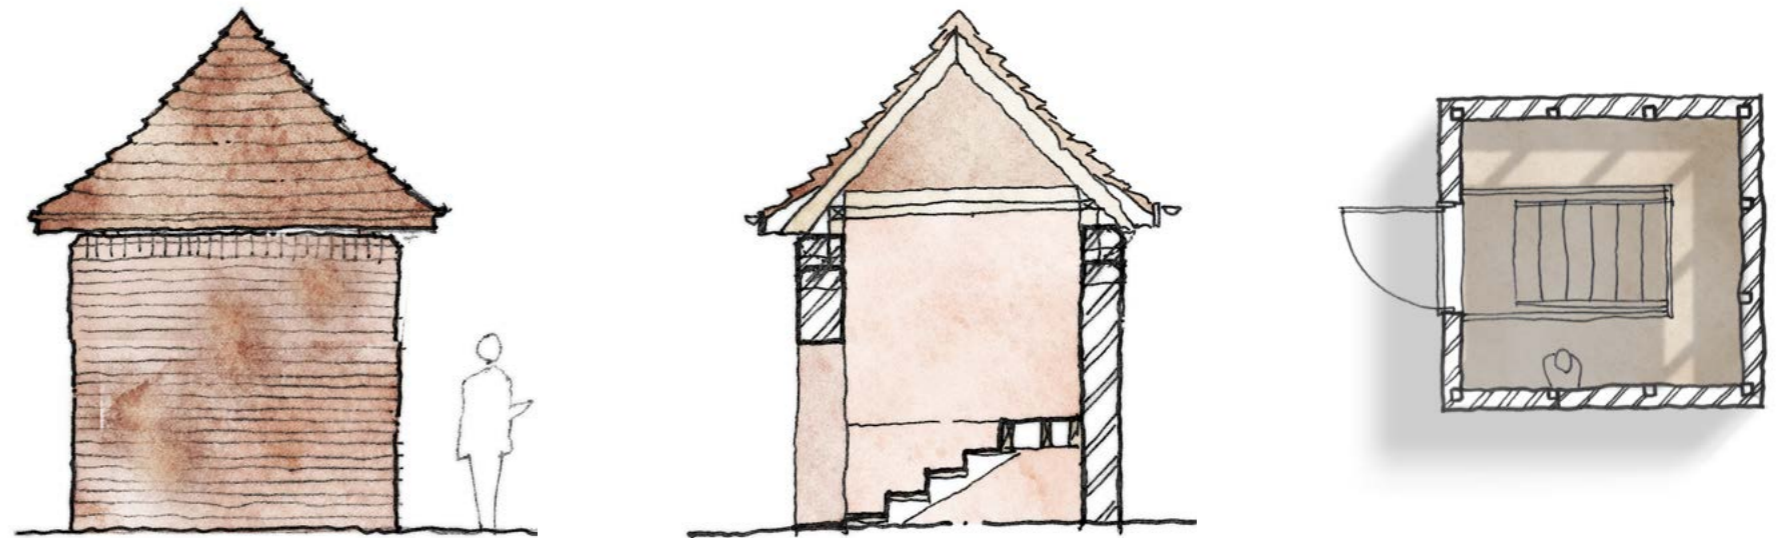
Conduit House Proposed Elevation FIGURE 84. Conduit House Proposed Section FIGURE 85. Conduit House Proposed Plan
